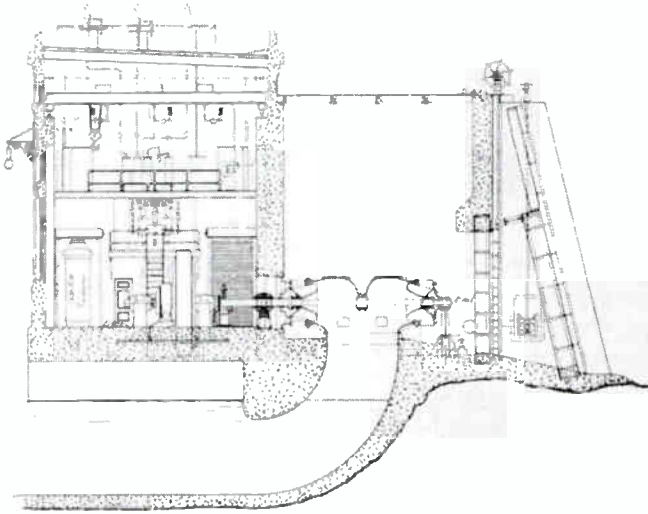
Sectional view of power house and flume showing compact arrangement of the equipment
